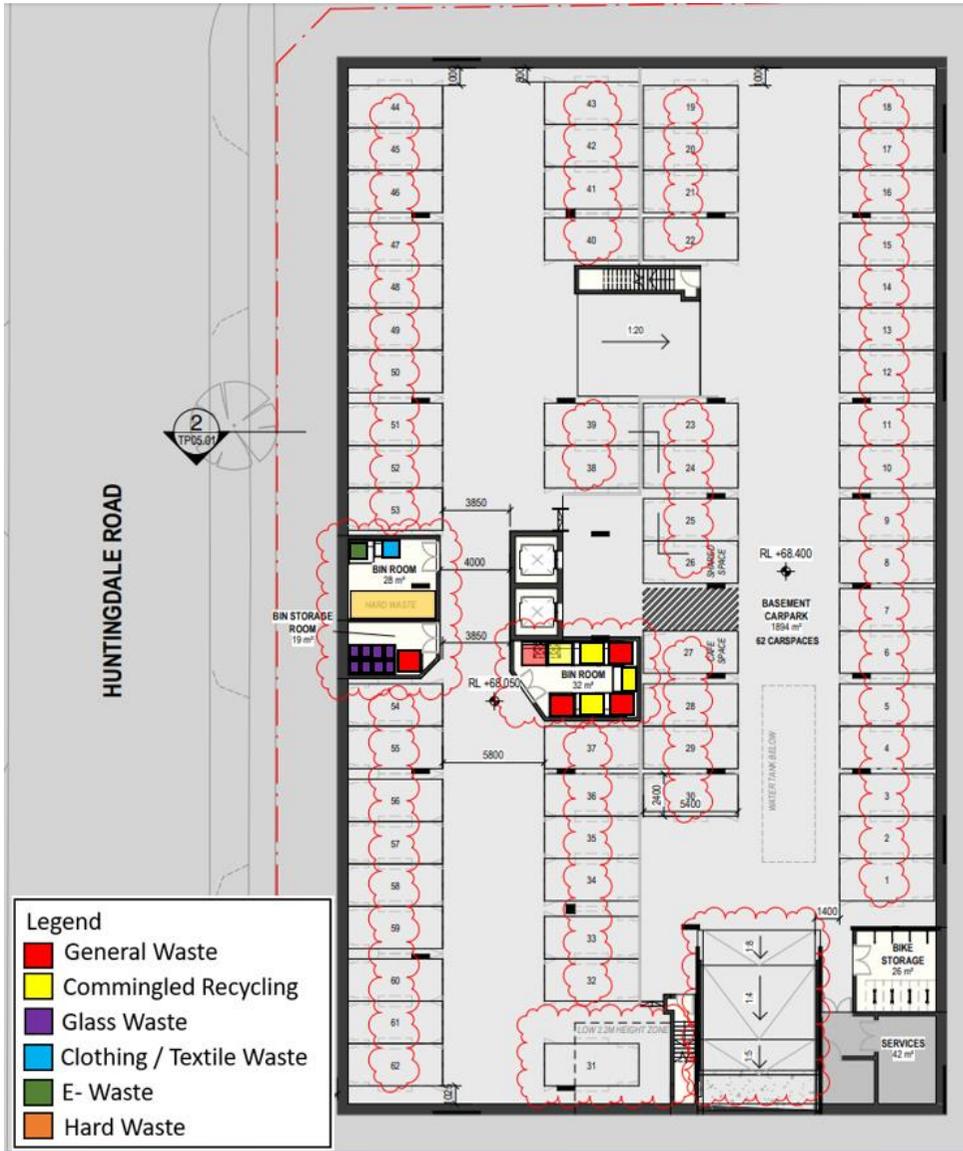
DEVELOPMENT PLAN – 4-STORY RESIDENTIAL BUILDING (FUTURE)
